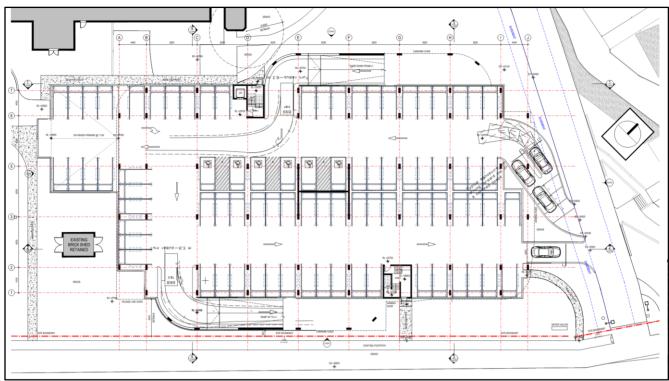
Proposed Ground Floor Plan of the Multi-Storey Car Park (Gray Puksand GP-AR-C1300)
